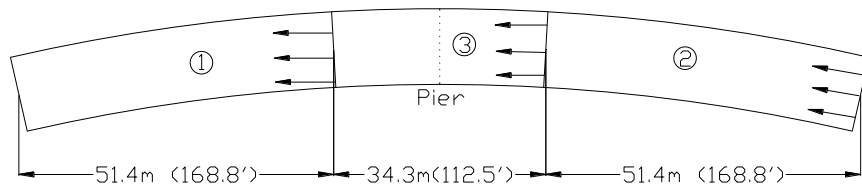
Stage 4 of Construction for Paired Girder (Inner Girders Placed First) Erection of Two Equal Span, 4-Girder, 305-m (1000-ft) Radius Bridge.
